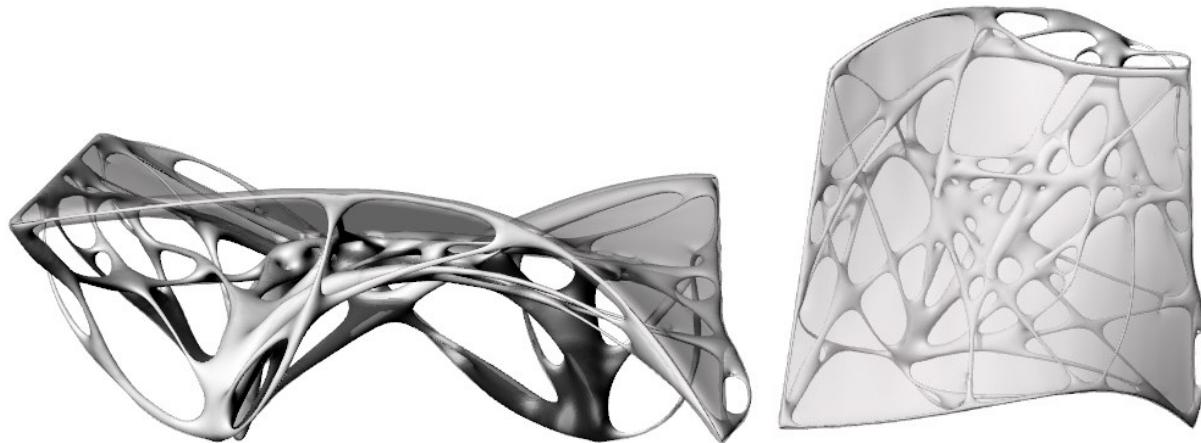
Side and top view of a pavilion sized structure supporting a curved roof
